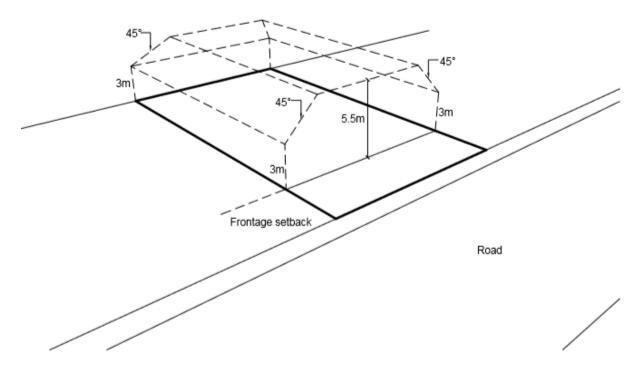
Building envelope as required by clause CCO-S5.7.1 A1 and A2 that is in substitution for General Residential Zone – clause 8.4.2 A3 and clause 8.5.1 A2
